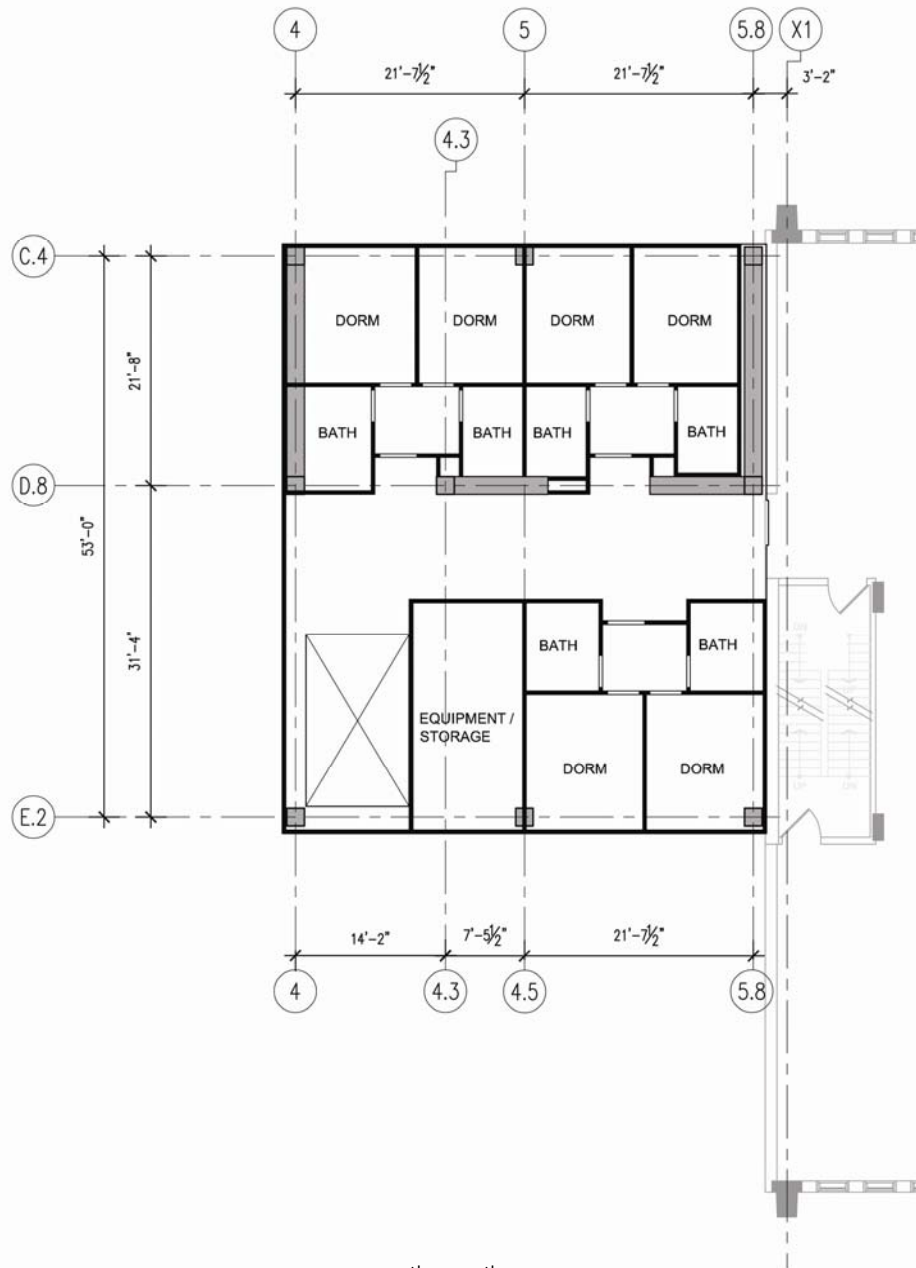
5<sup>th</sup> Floor Room Layout Plan
